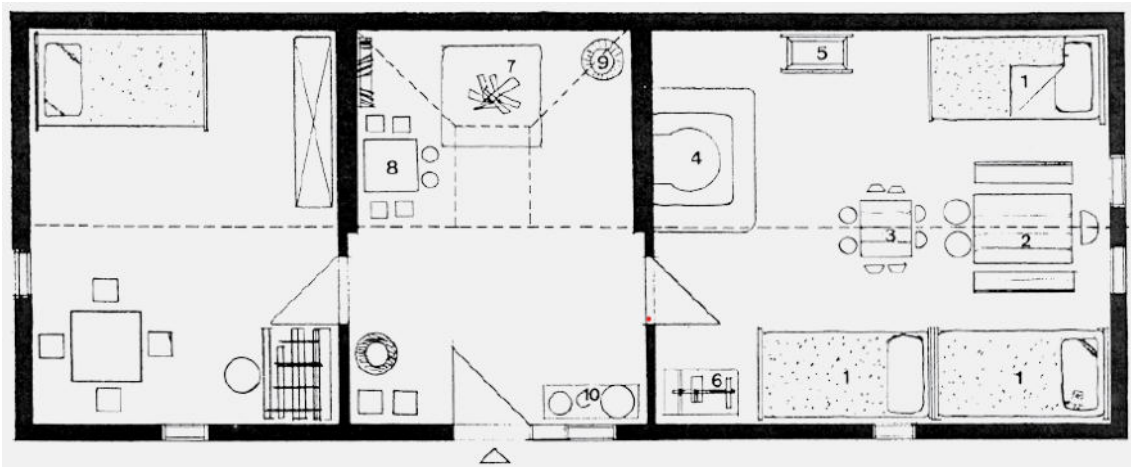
Plan of three-room Slavonian house (Živković, 2013)
